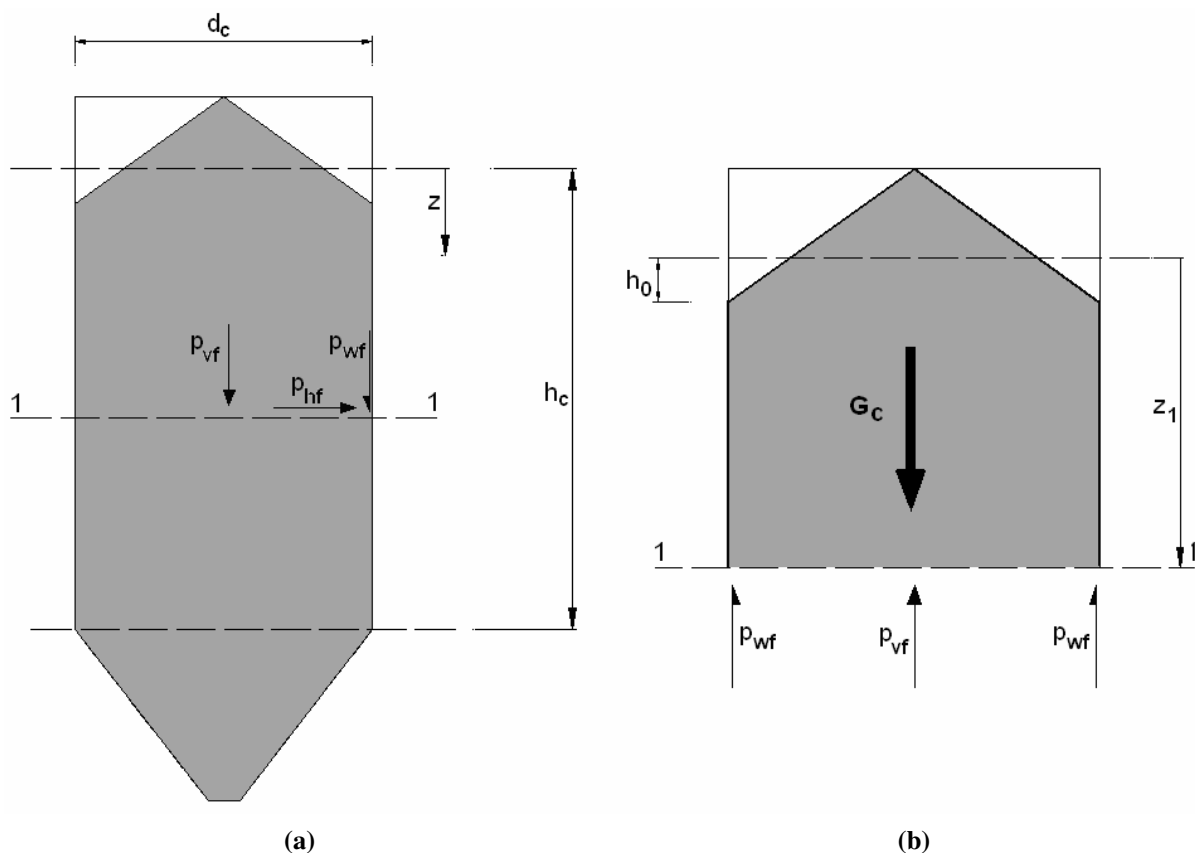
Filling pressures on silo cylinder wall (a) and the equilibrium condition (b)
